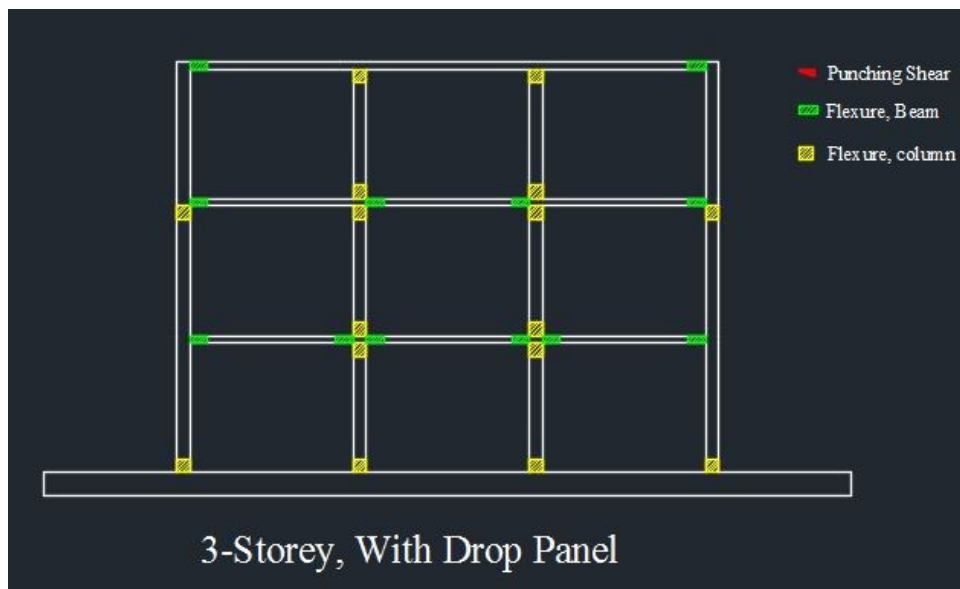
6 : Hinge Formation for 3-Storey Model Building at Collapse Load (With Drop Panel)
